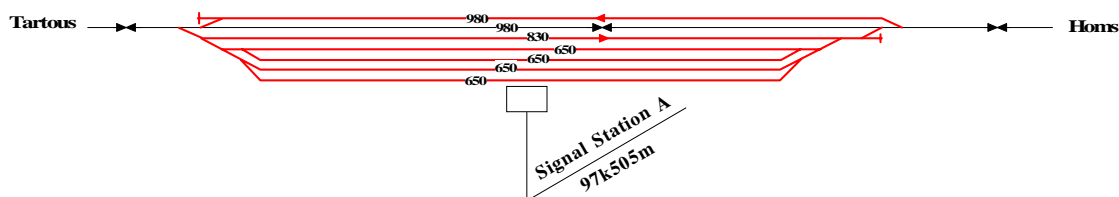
Station Yard Track Layout of Signal Station A
